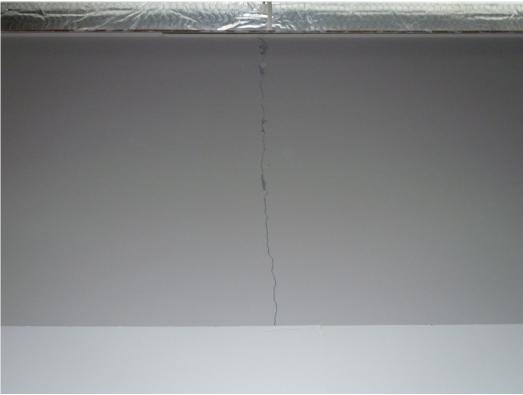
Interior view of vertical crack on the south wall panel
